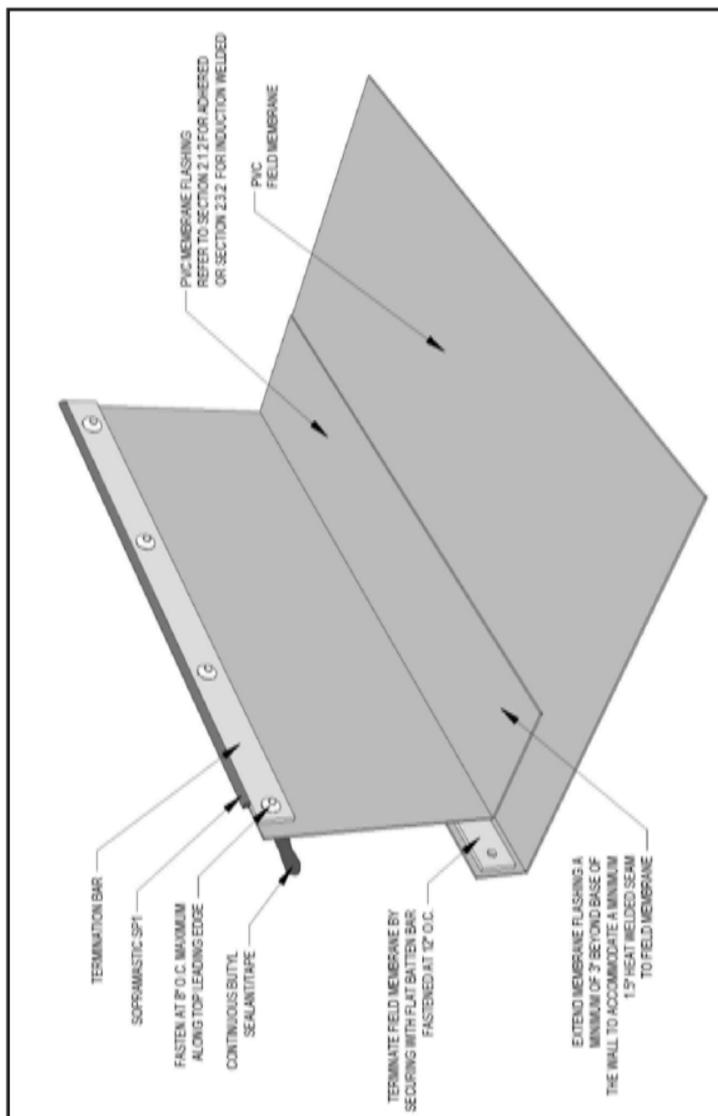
PVC Field Membrane At Wall/Curb With Vertical Perimeter Fastening
